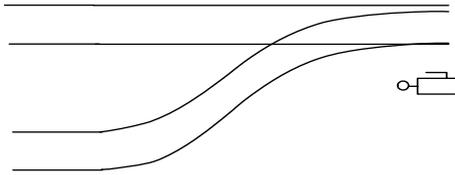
Symbol for a Dual Control Power Switch Machine
